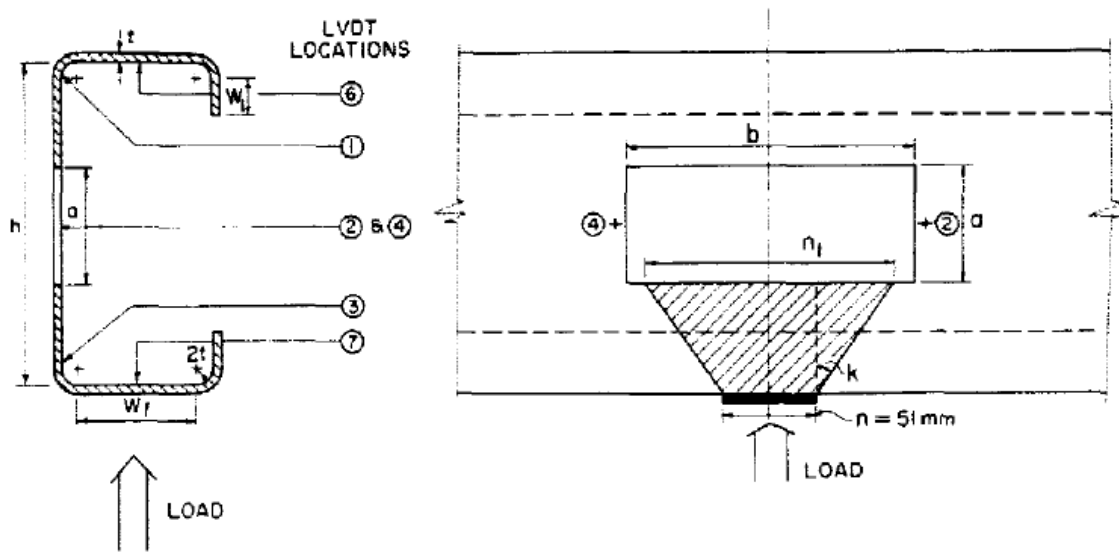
Typical cross-section of C-section specimens tested by Sivakumaran and Zielonka (1989)
